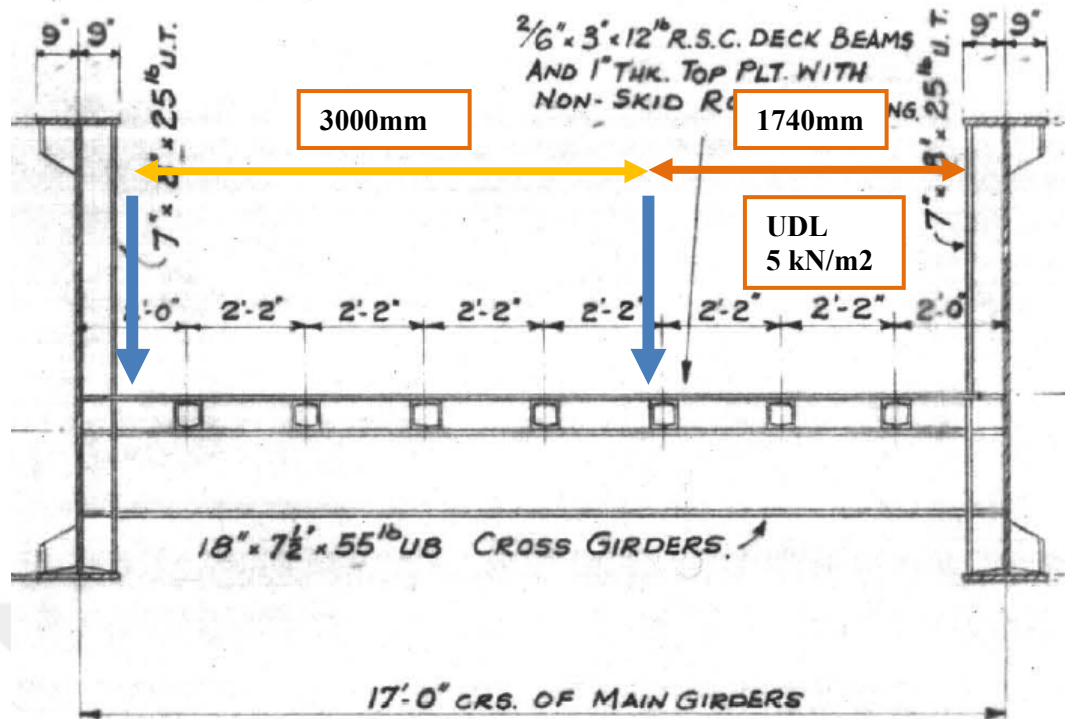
Unfavorable wheel load configuration for main girder.
